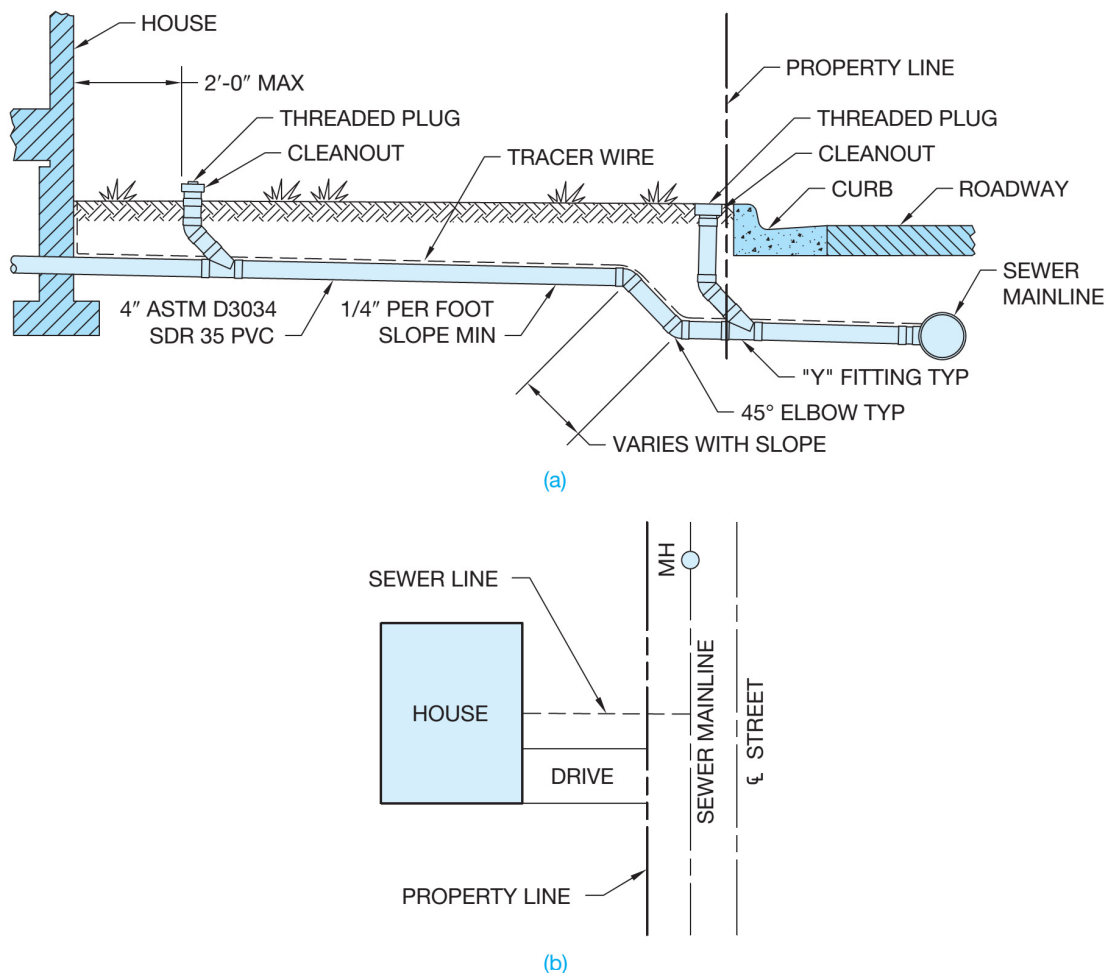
(a) A cross section through a typical public sewer installation. (b) A site plan showing a house and public sewer layout.
